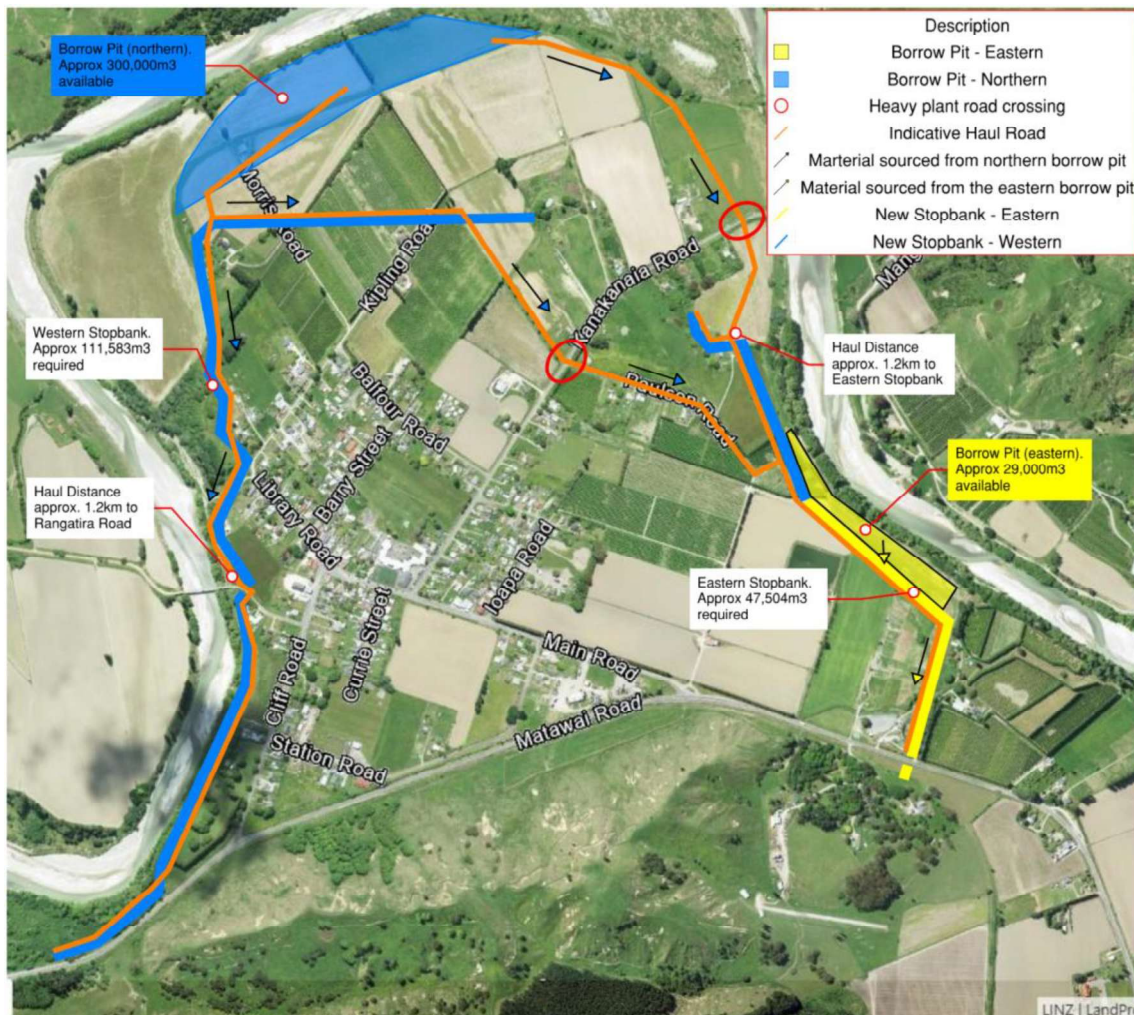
Example of Off-road haul road layout with Kanakanaia Road crossing
